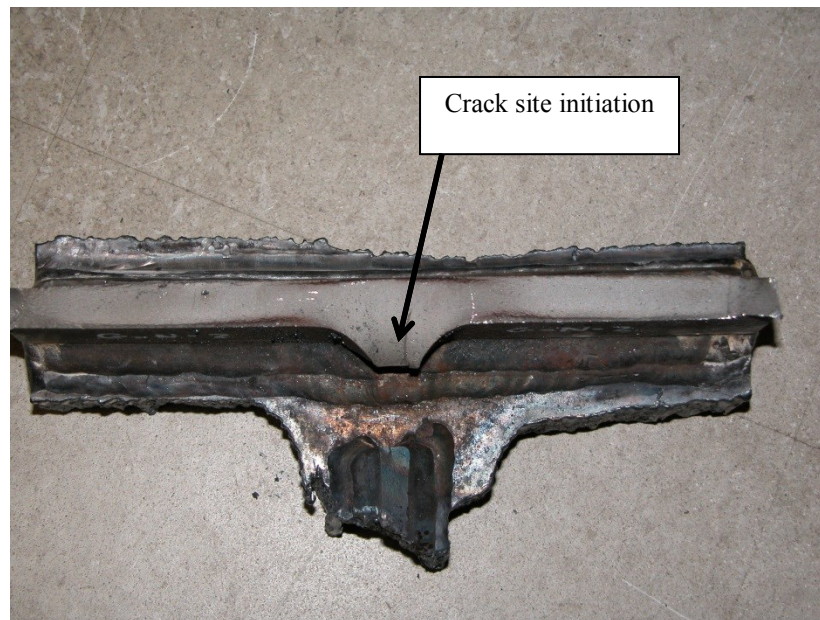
Fractured surface of side 1 of specimen G-N-2.
